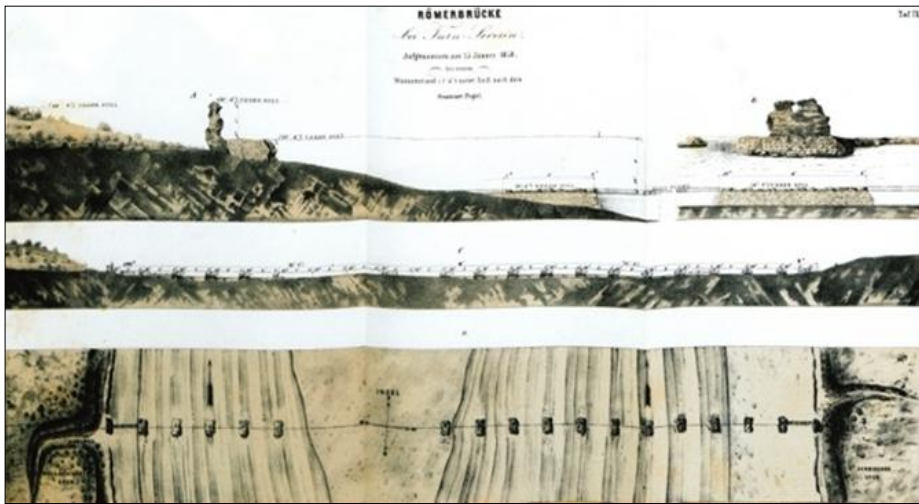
Transverse profile and plan of the ruins of Roman bridge from Drobeta (Asbach 1858 Taf).
